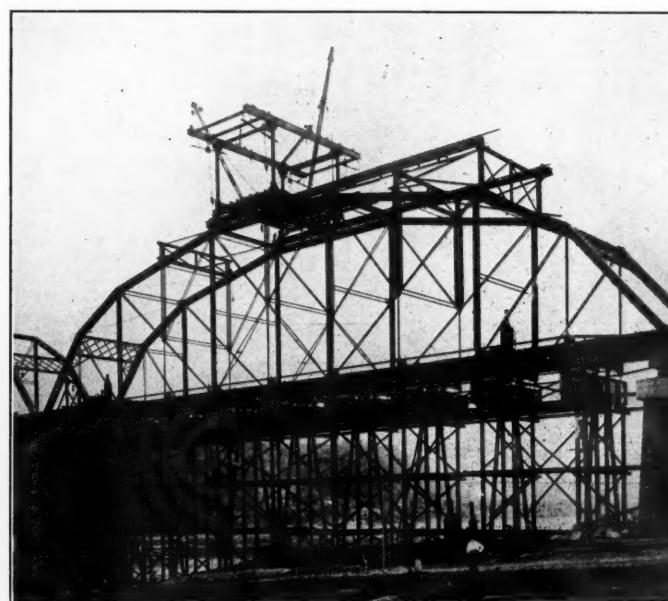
Old Span 1 Showing False Work Carrying Traffic and Small Traveler Erected on Old Trusses to Place New Span.
